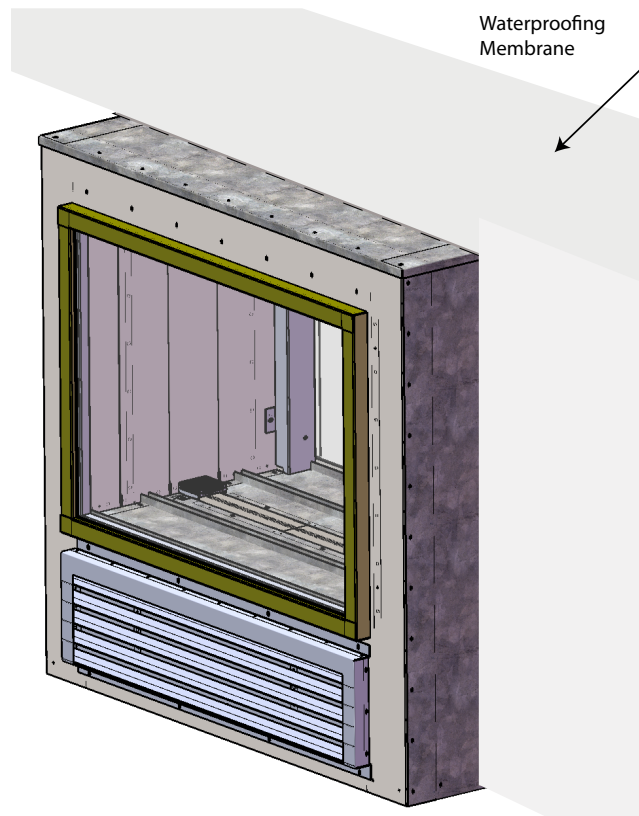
Cover the flashing with the approved waterproofing membrane for the building
